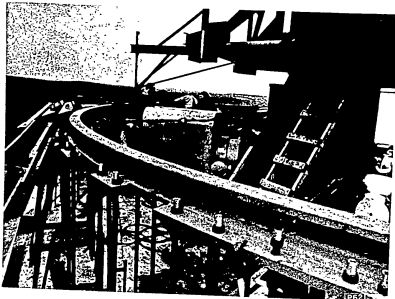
Installation of survival rail showing A-frames supporting the rail, anchor bolts suspended from the rail sole plates and reinforcing rods protruding from tower roof.
